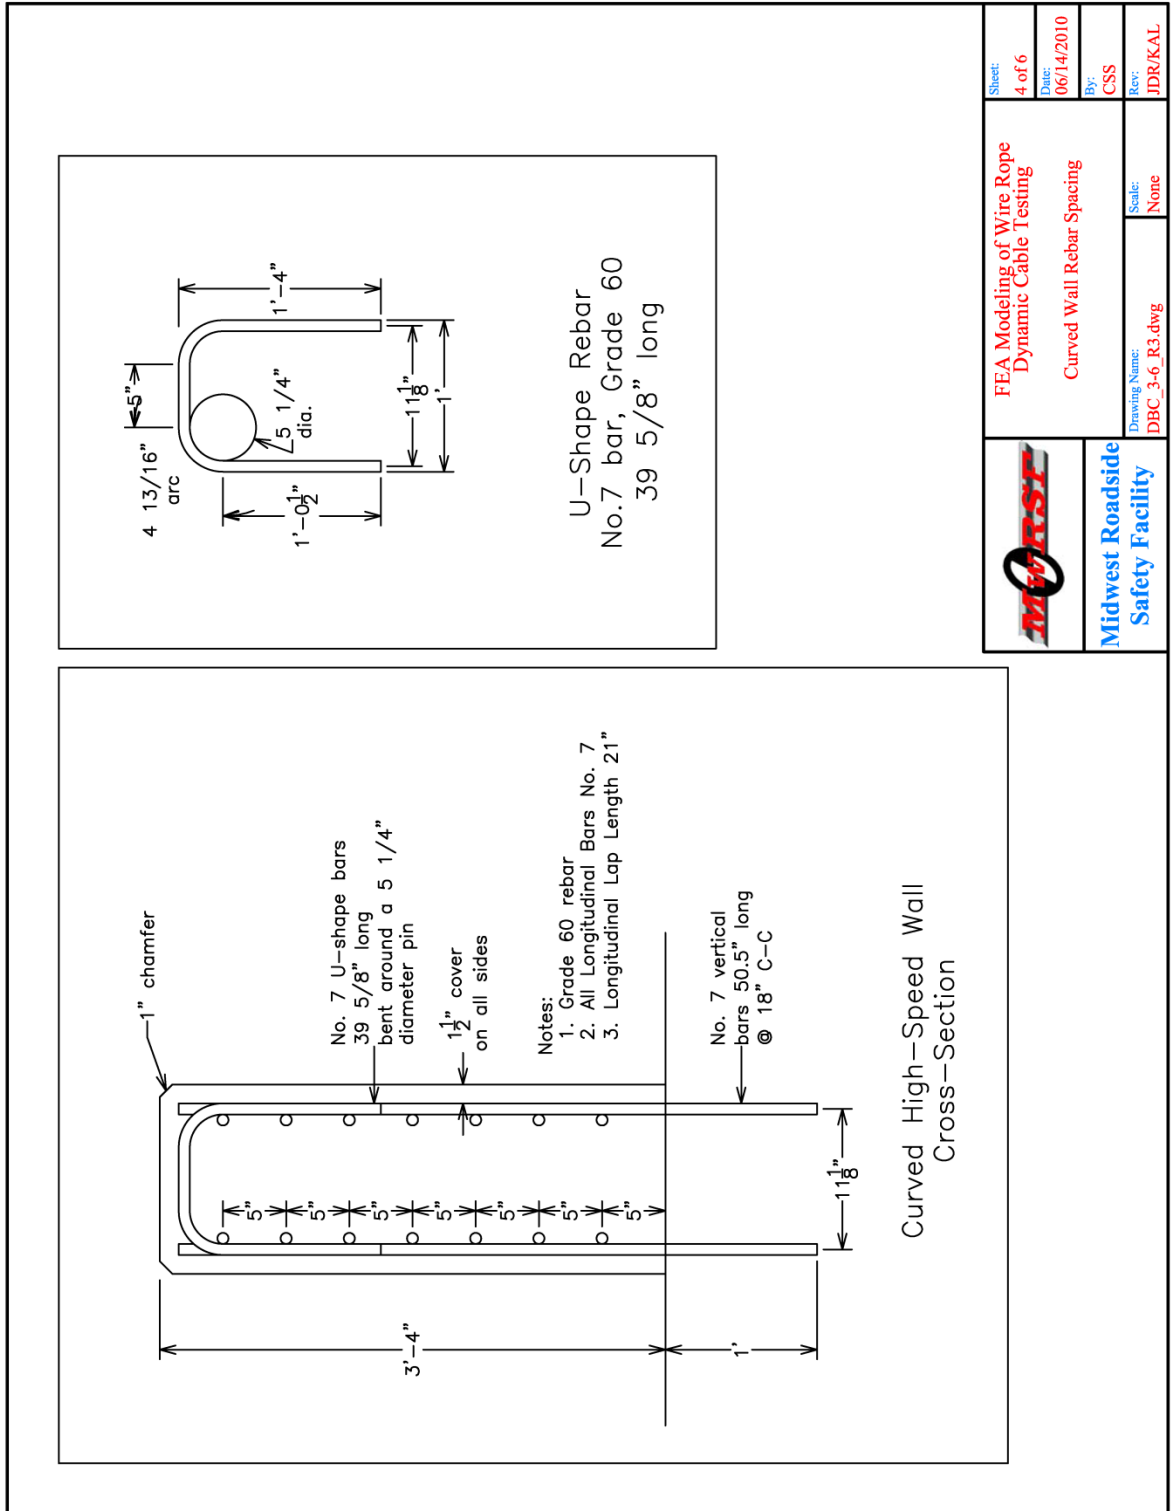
Concrete Wall Reinforcement Details, Test No. DBC-1 through DBC-6
